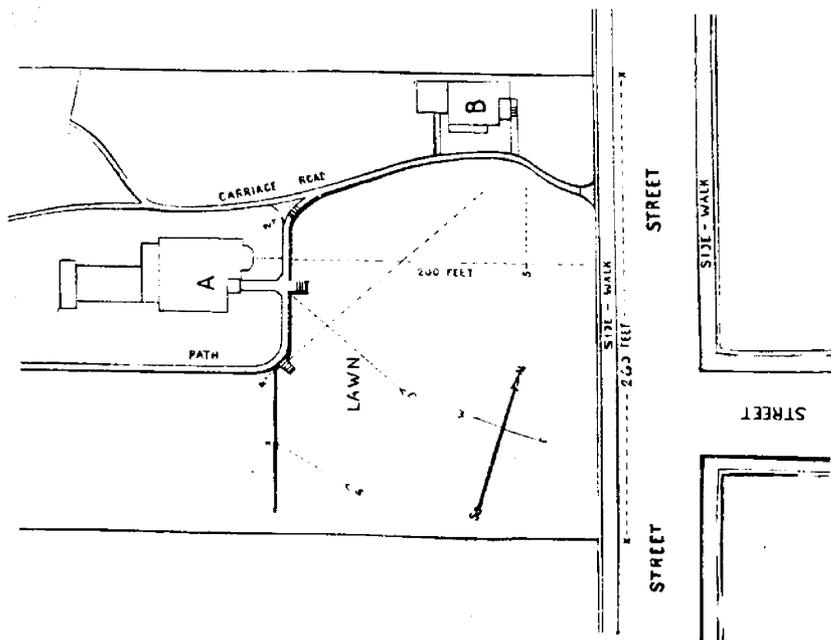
PLAN OF MR. BEALL'S GROUNDS.
